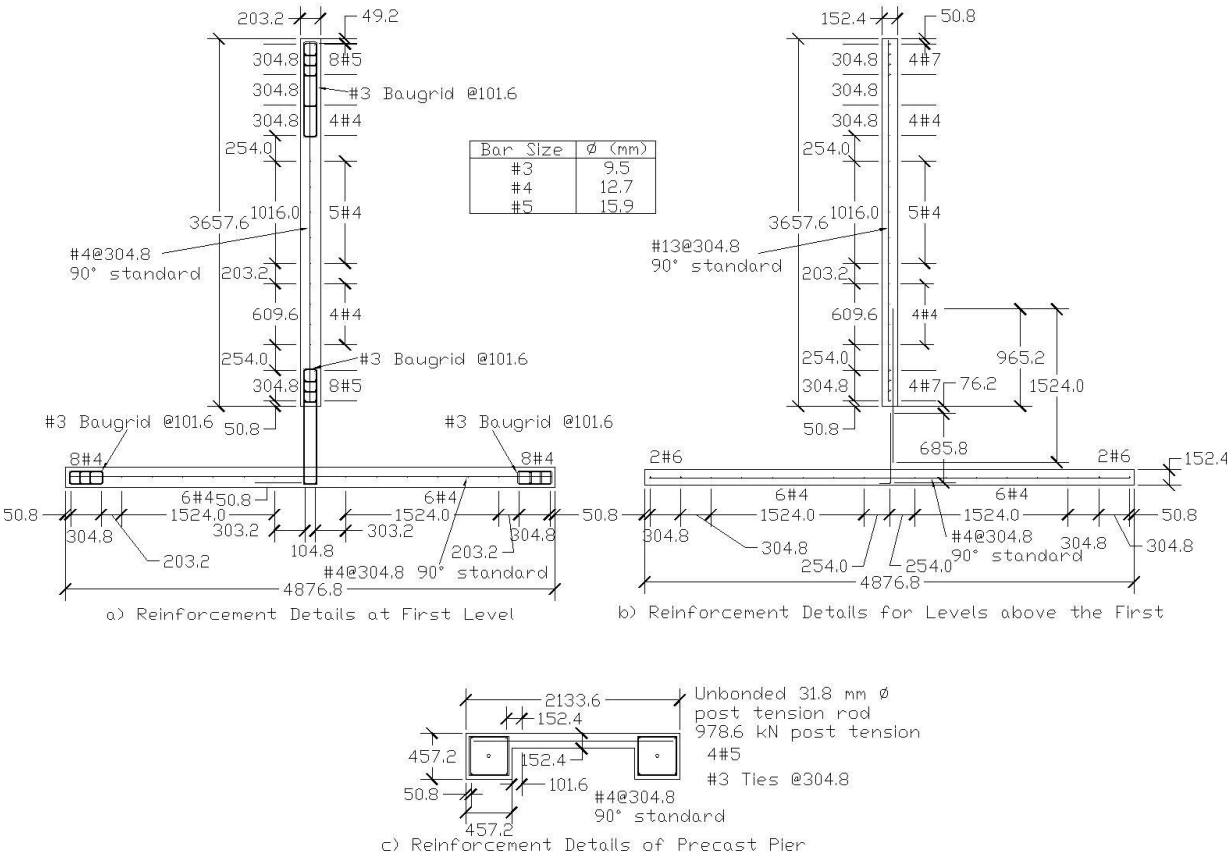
Wall and Pier Reinforcement Details [after NEES7Story, 2006]
